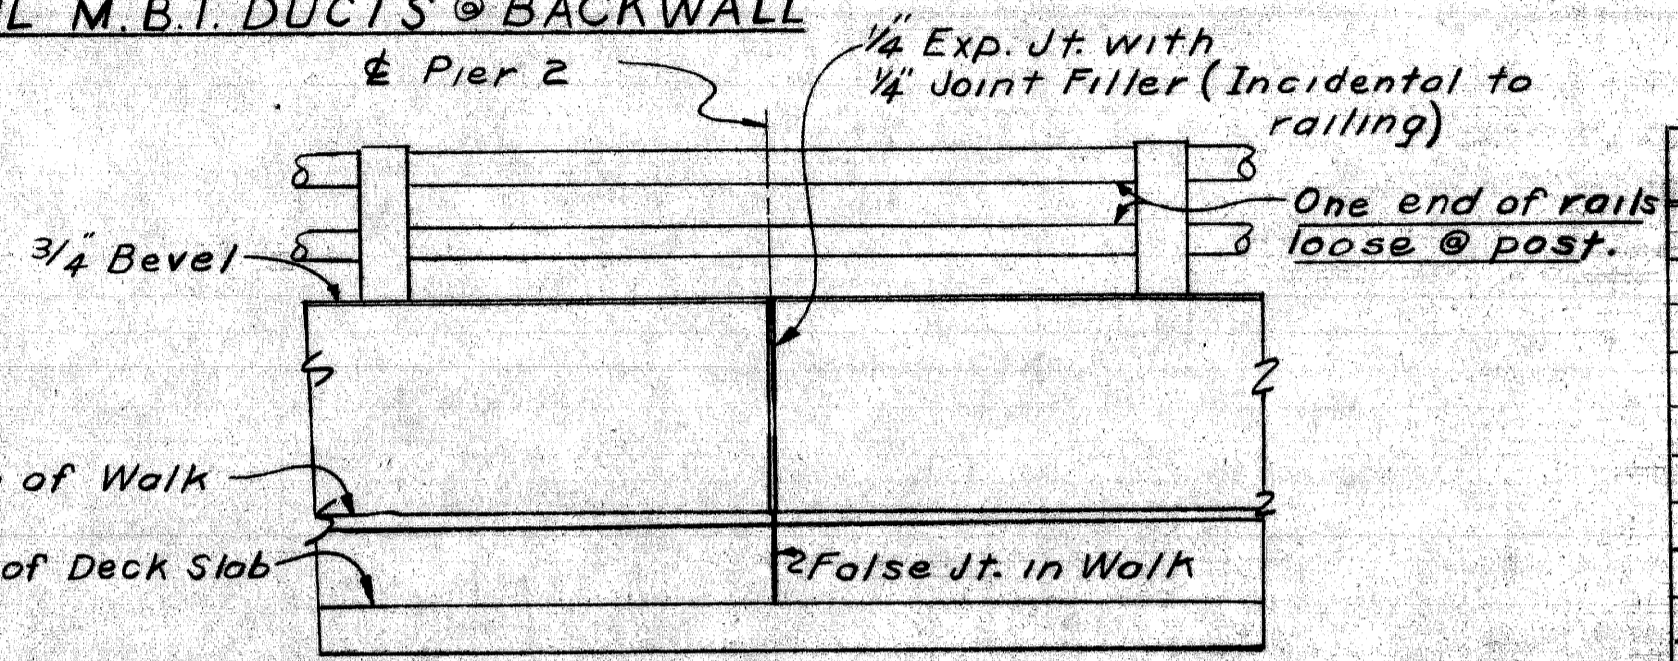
DETAIL AT EXPANSION JOINT-6-4 P.L.C.
